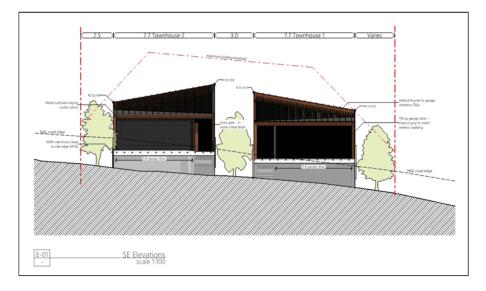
Rear elevation of proposed multiple dwellings. Note the road level is the black dotted line.
